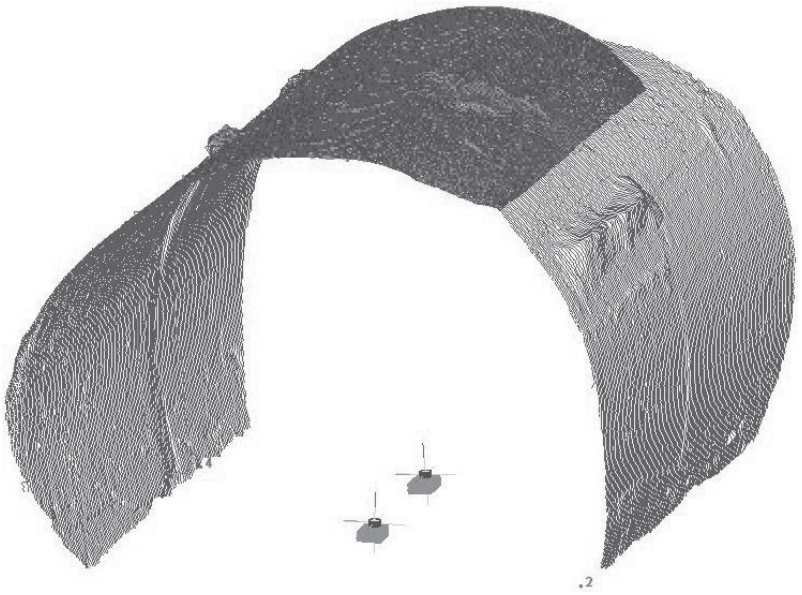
Closely spaced tunnel sections showing damage areas and camera locations for the crown DTM
